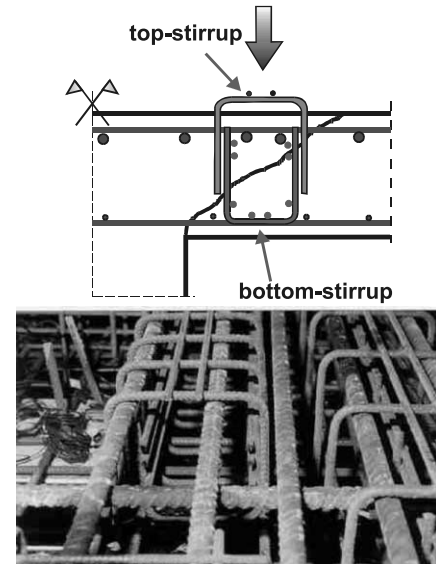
Type I: stirrups made of fabric reinforcement with a vertical splice and without enclosing the bottom flexural reinforcement.
